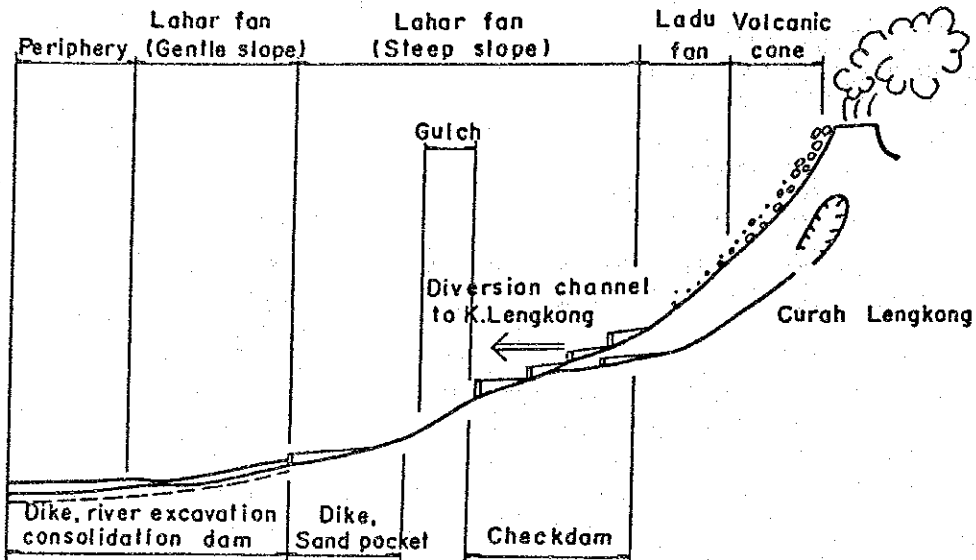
Schematic Drawing of the Plan of Sediment Control Facilities in K. Rejali
